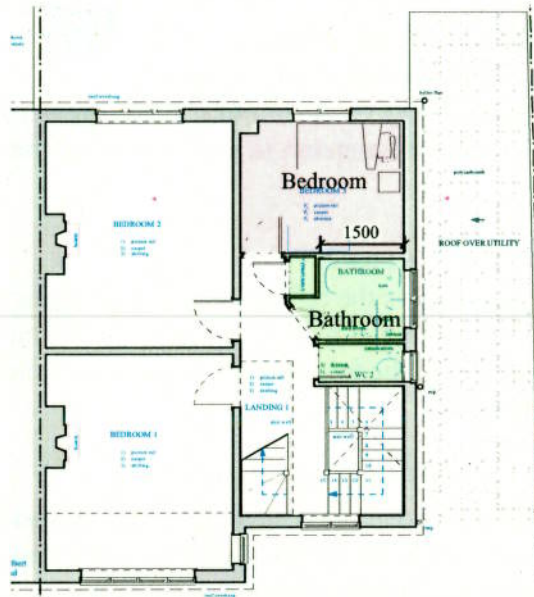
Existing small first floor bathroom (not able to fit a full size bath) & small 3rd bedroom at 1st floor
